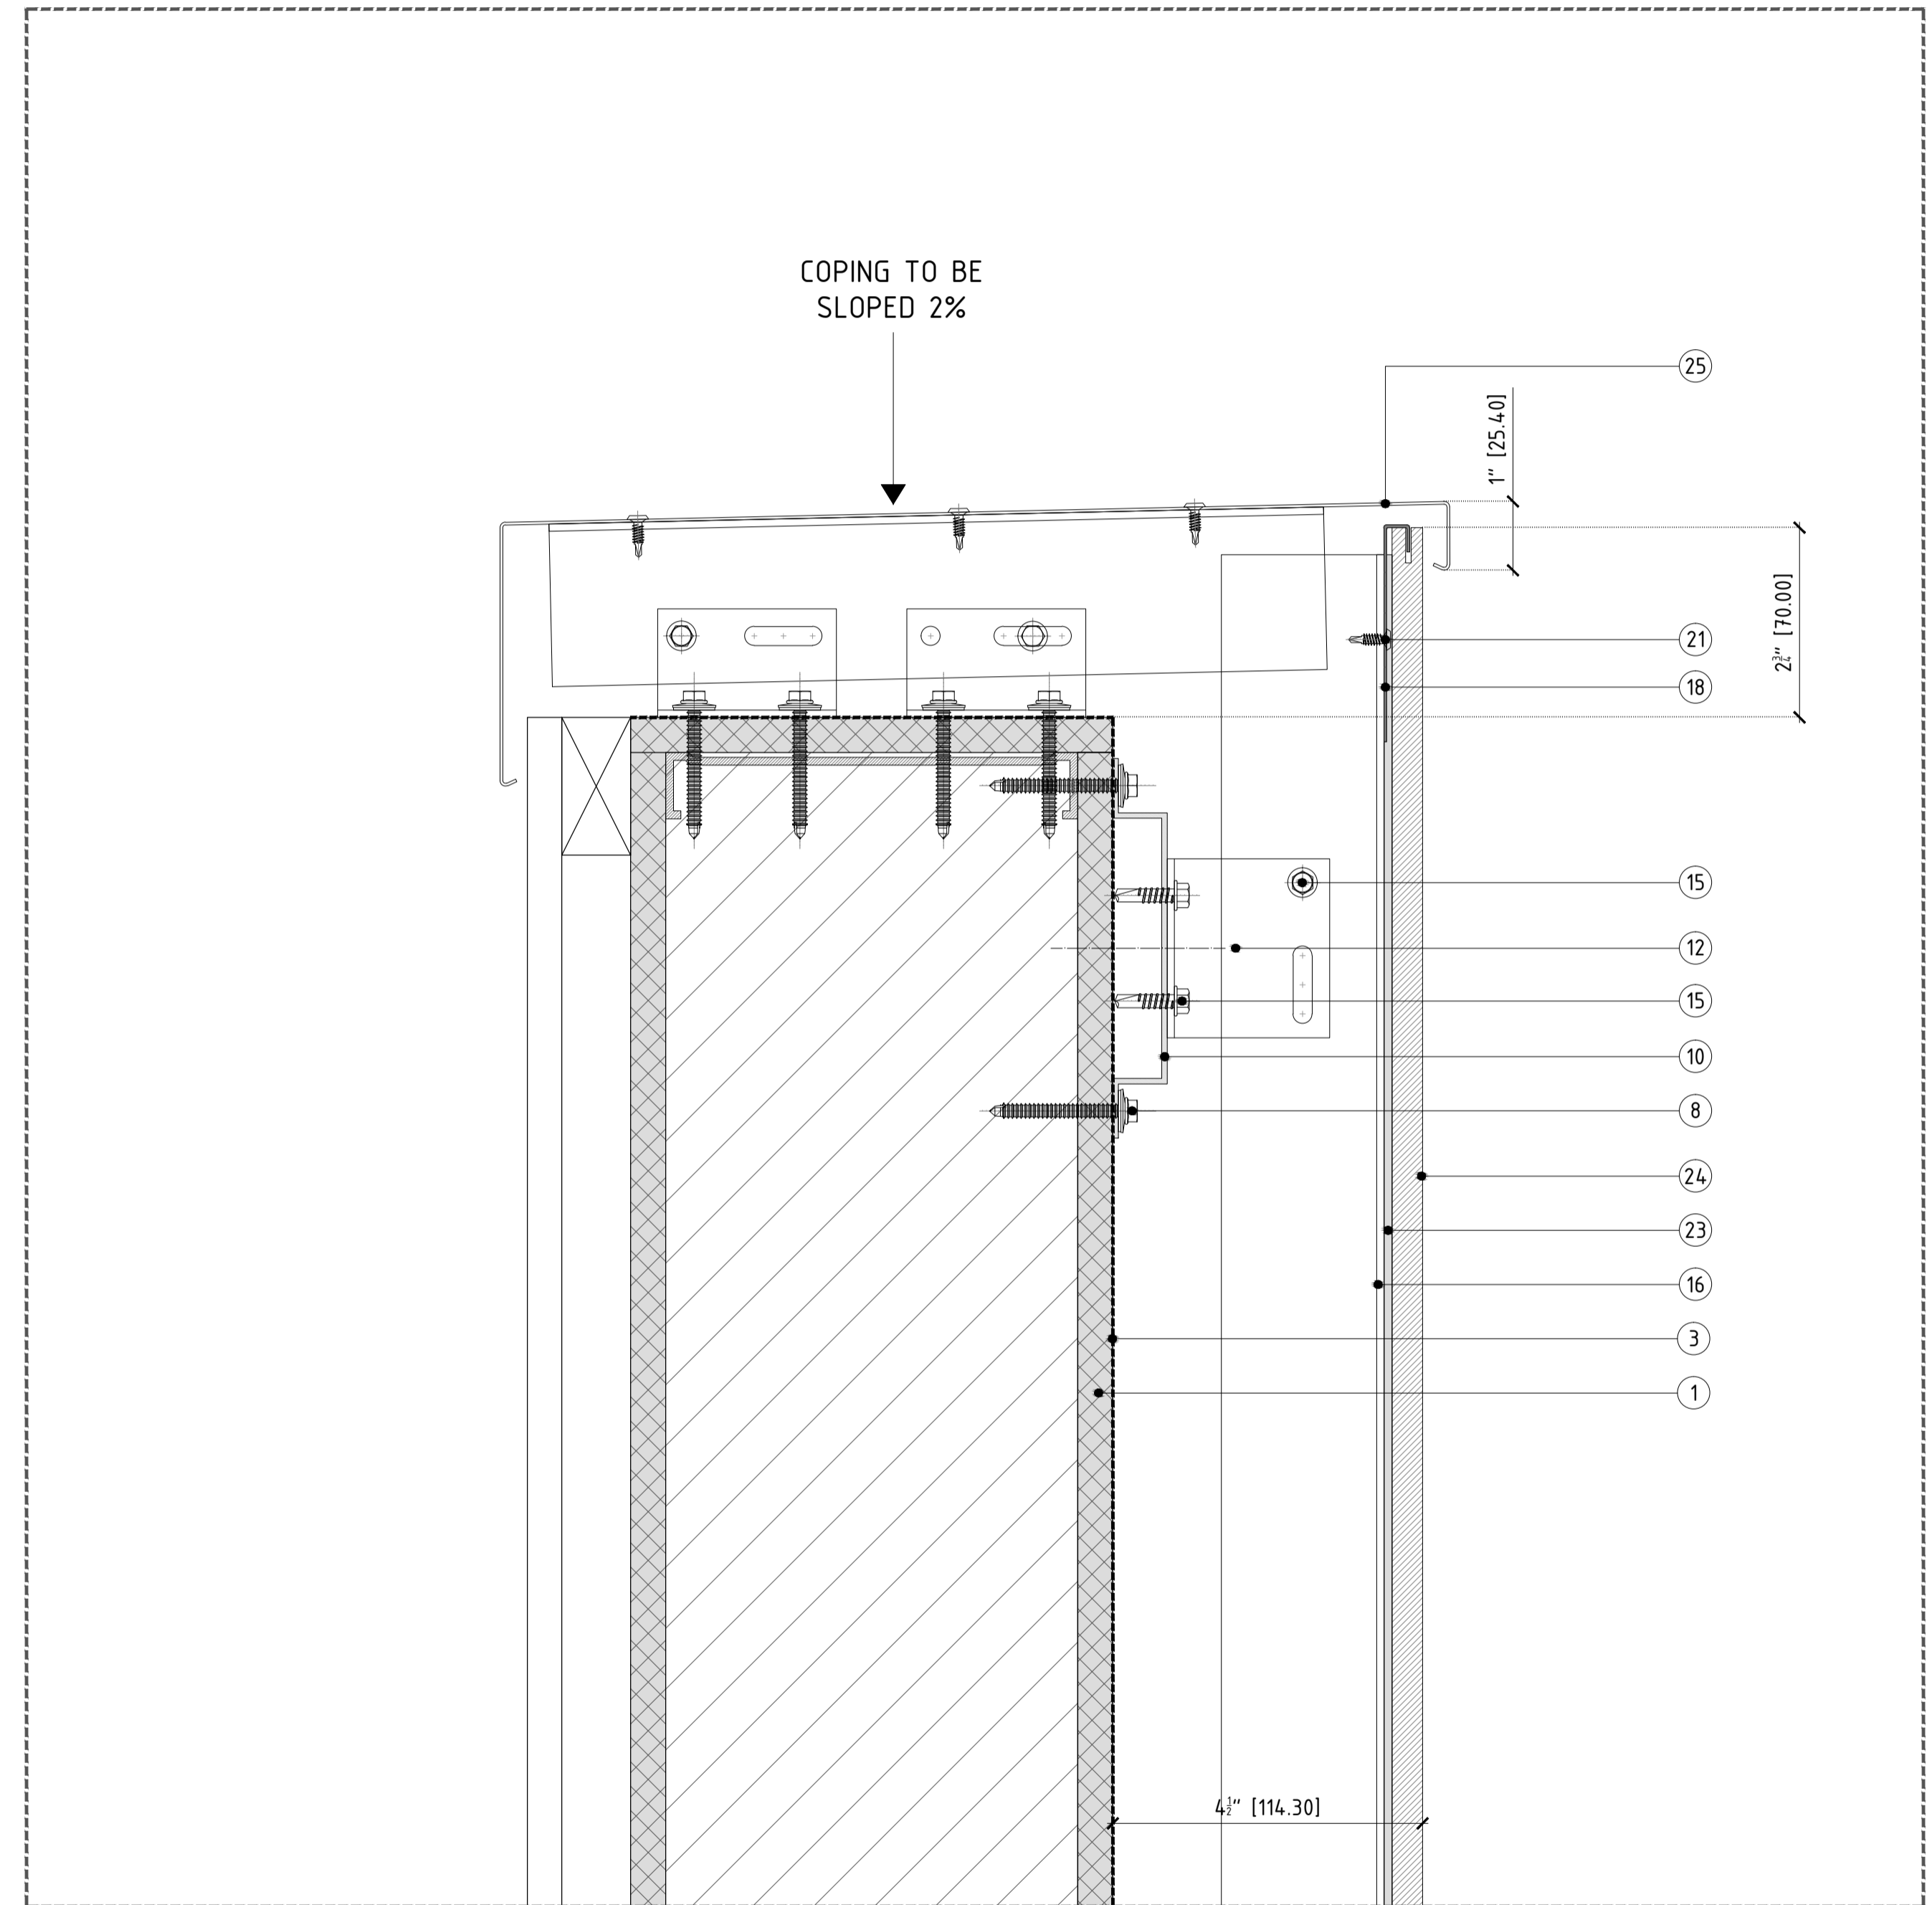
DETAIL A - TYPICAL COPING DETAIL WITH TILE
